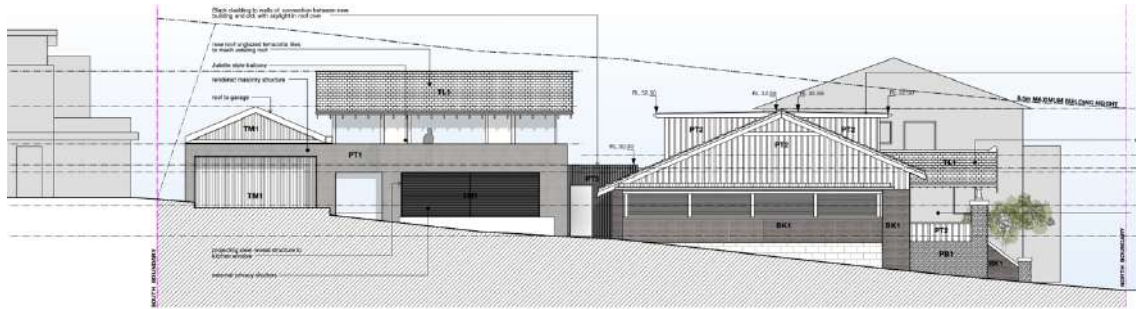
No. 32 Reddall Street, Manly. Approved DA2021/10356. College Street elevation.
